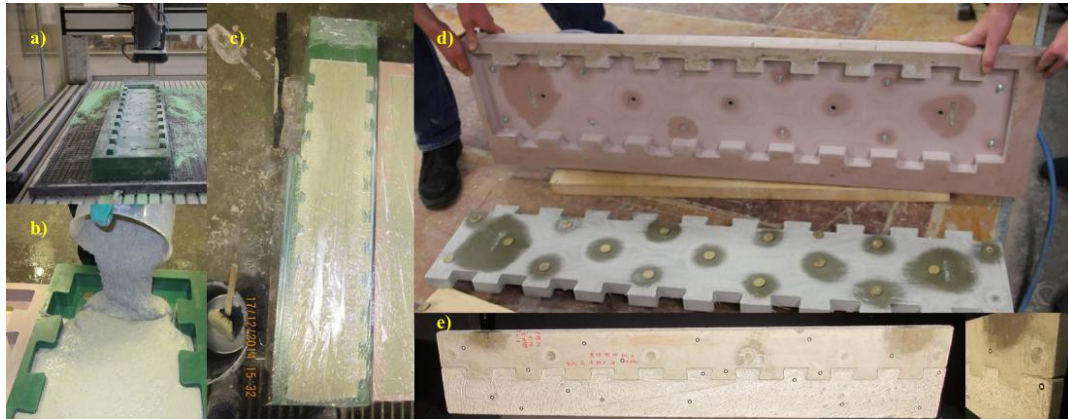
CNC fabrication of formwork (a), casting of the specimens (b), protection against demoulding of casted shell joint (c), demoulding (d), jointed linear shell element (e)
